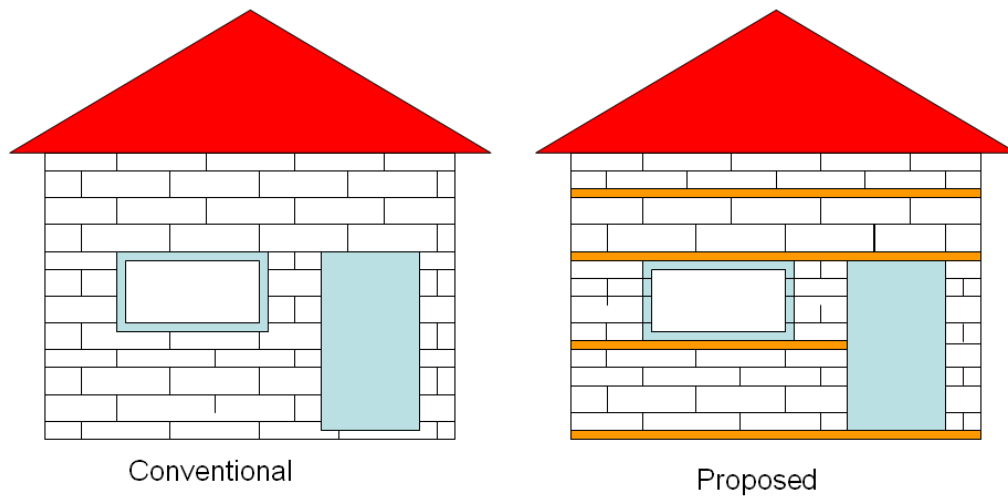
Illustrations of conventional and proposed masonry construction procedures.
